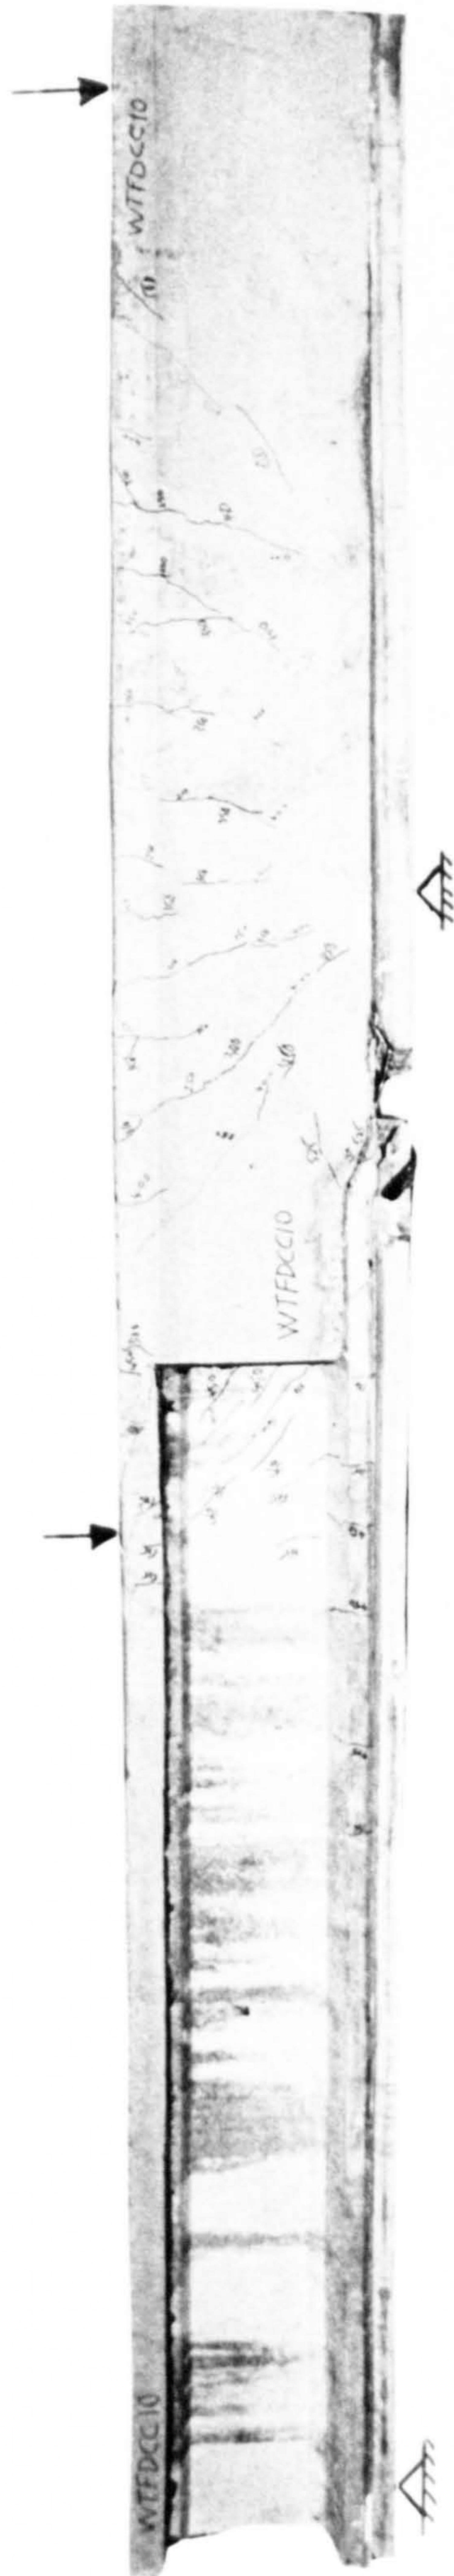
Longitudinal Elevation of Beam WTFDCC10 After Failure
